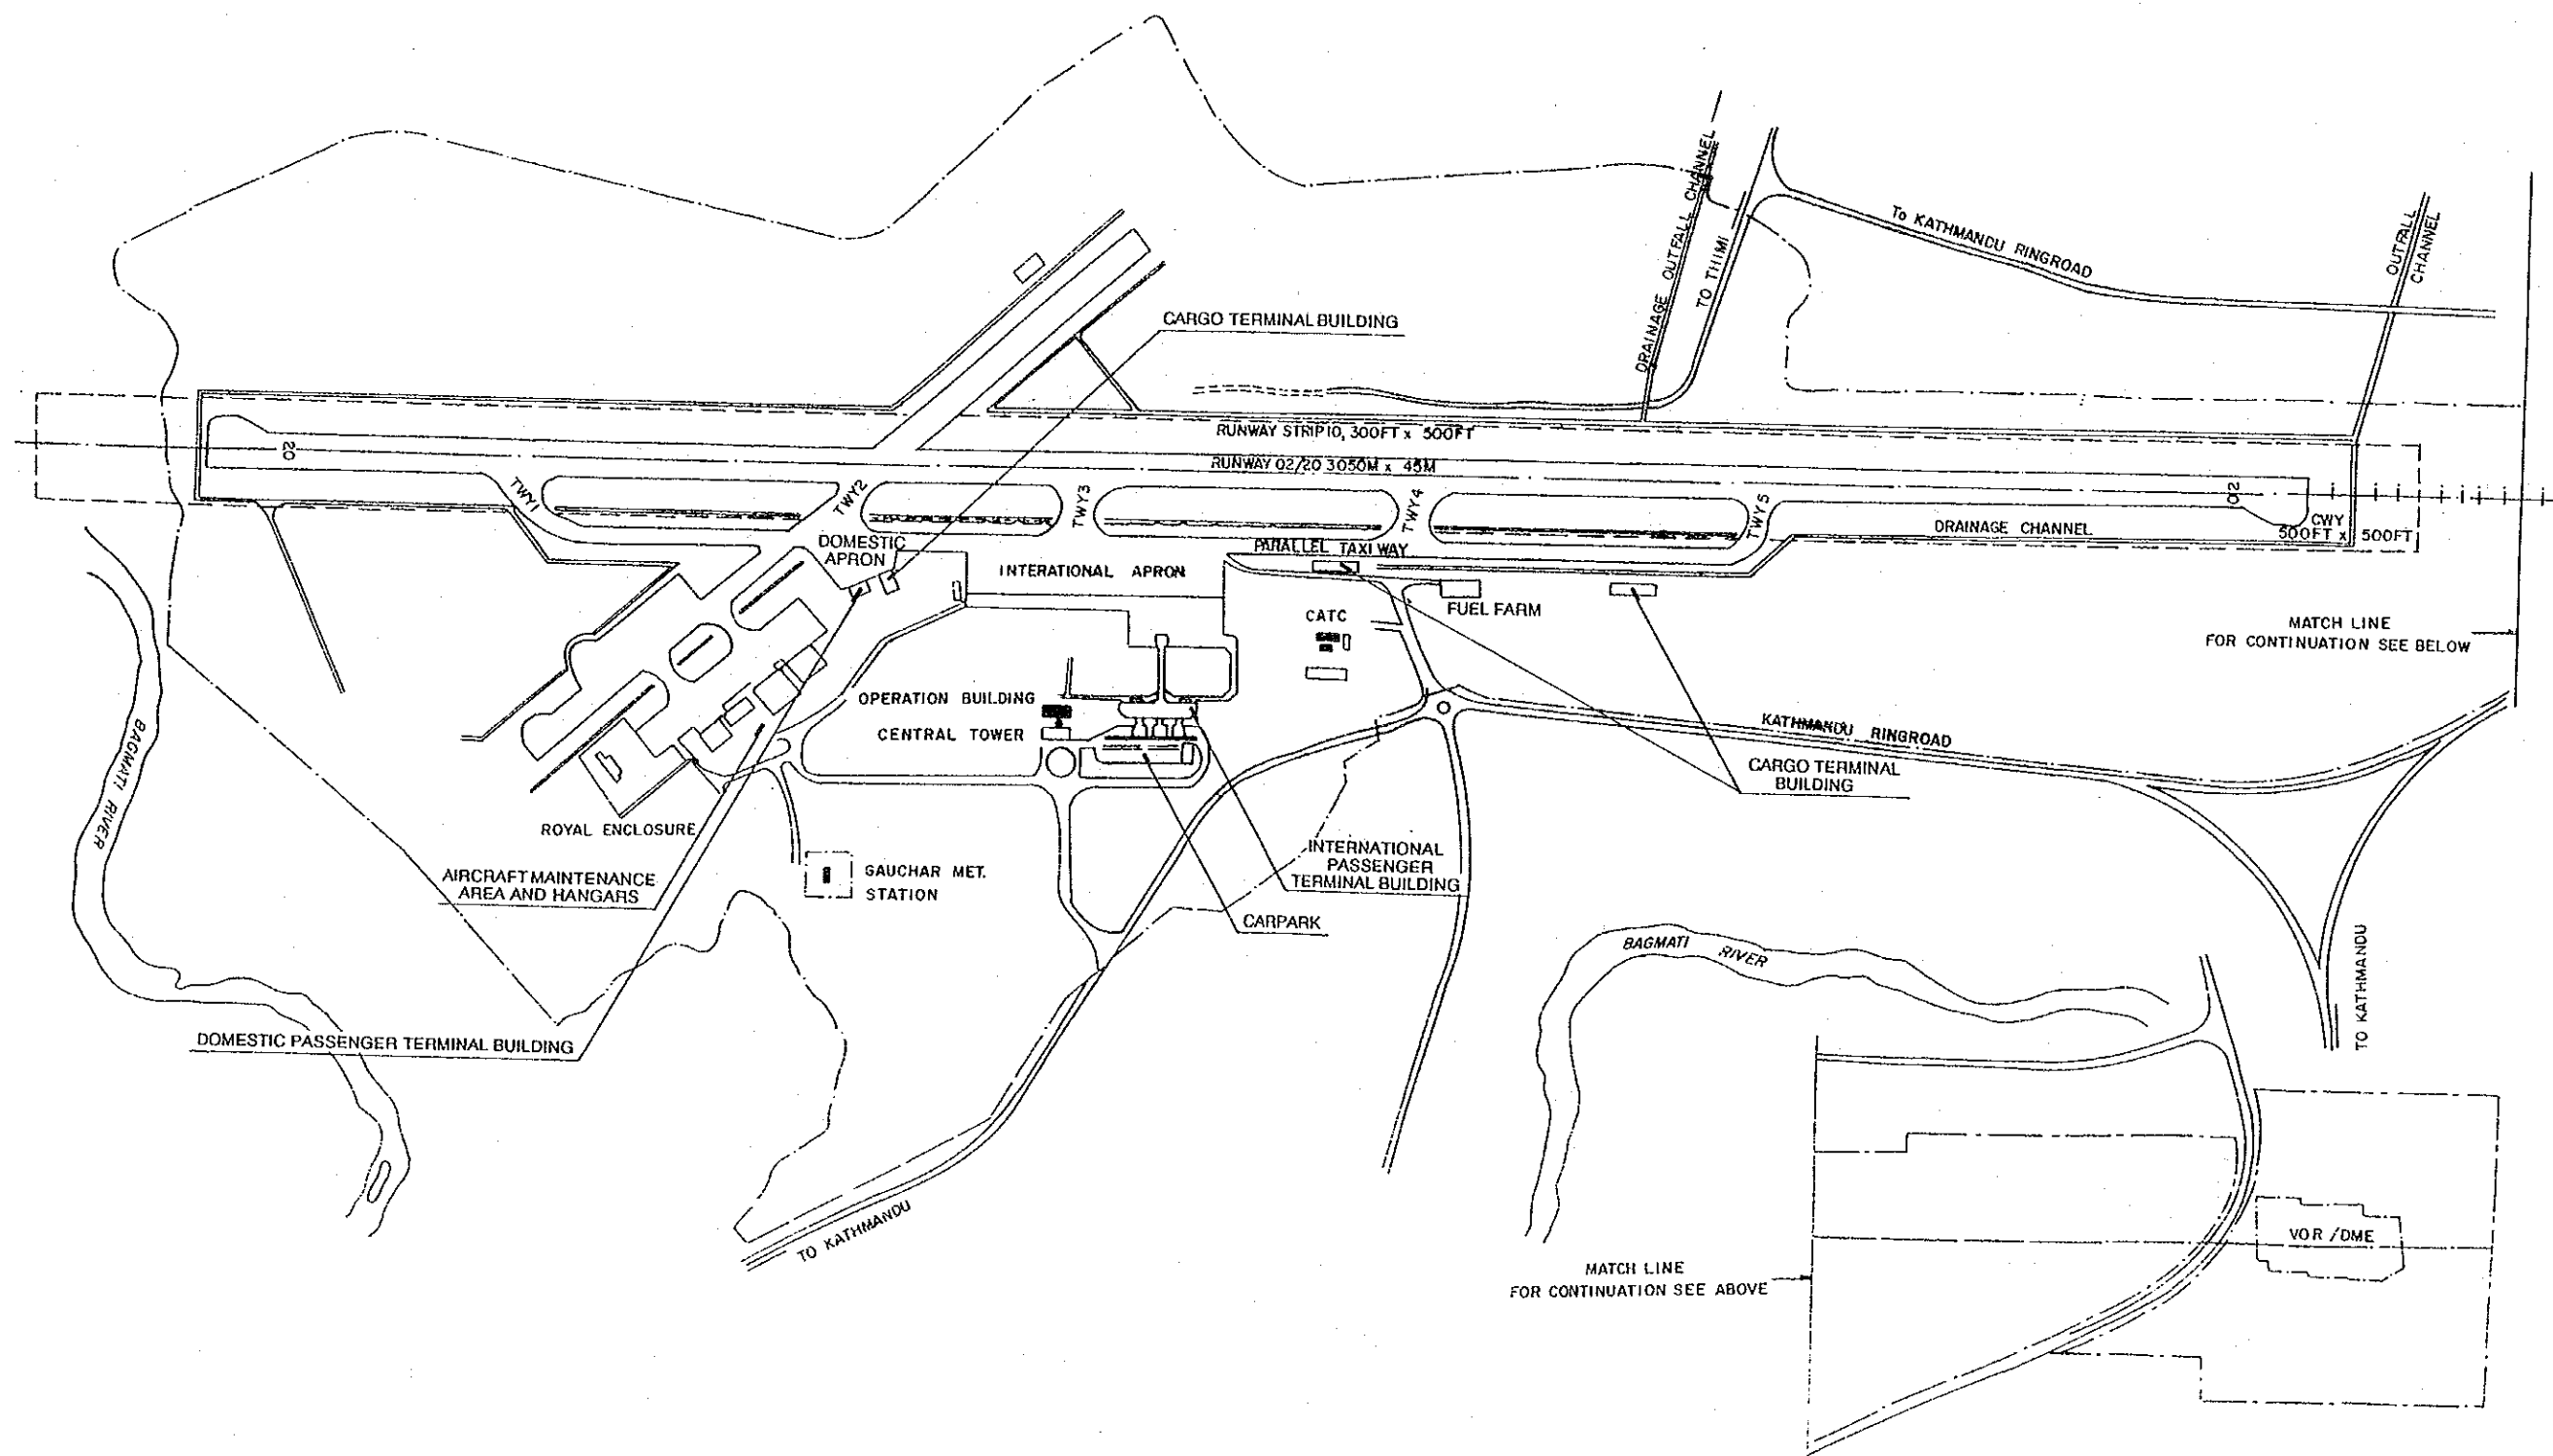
Layout Plan of Tribhuvan International Airport
